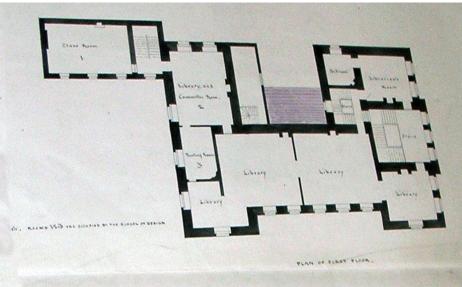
Floor plan of the Cork Athenaeum. Author's own photograph, original at OPW 5HC/4/935, National Archives, Dublin.
